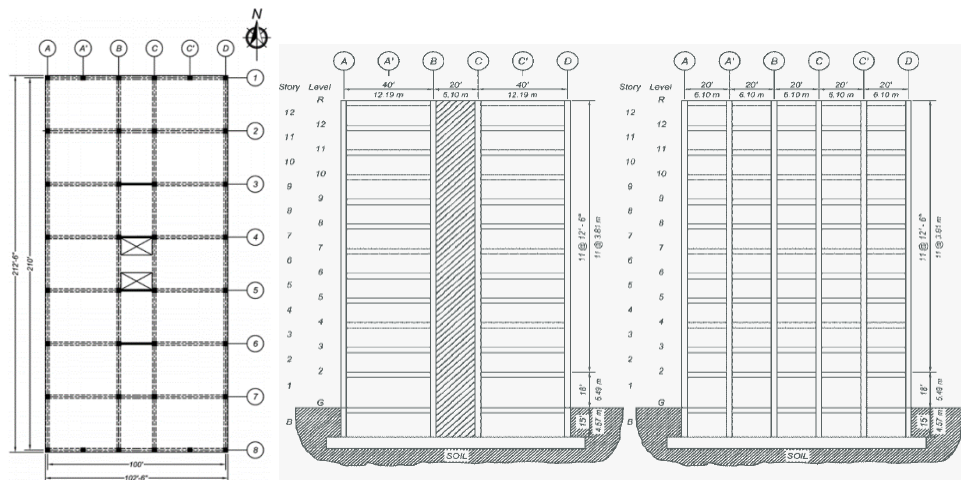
Archetype Building – Left: Plan View – Right: Elevation View (Barbosa, 2011)
